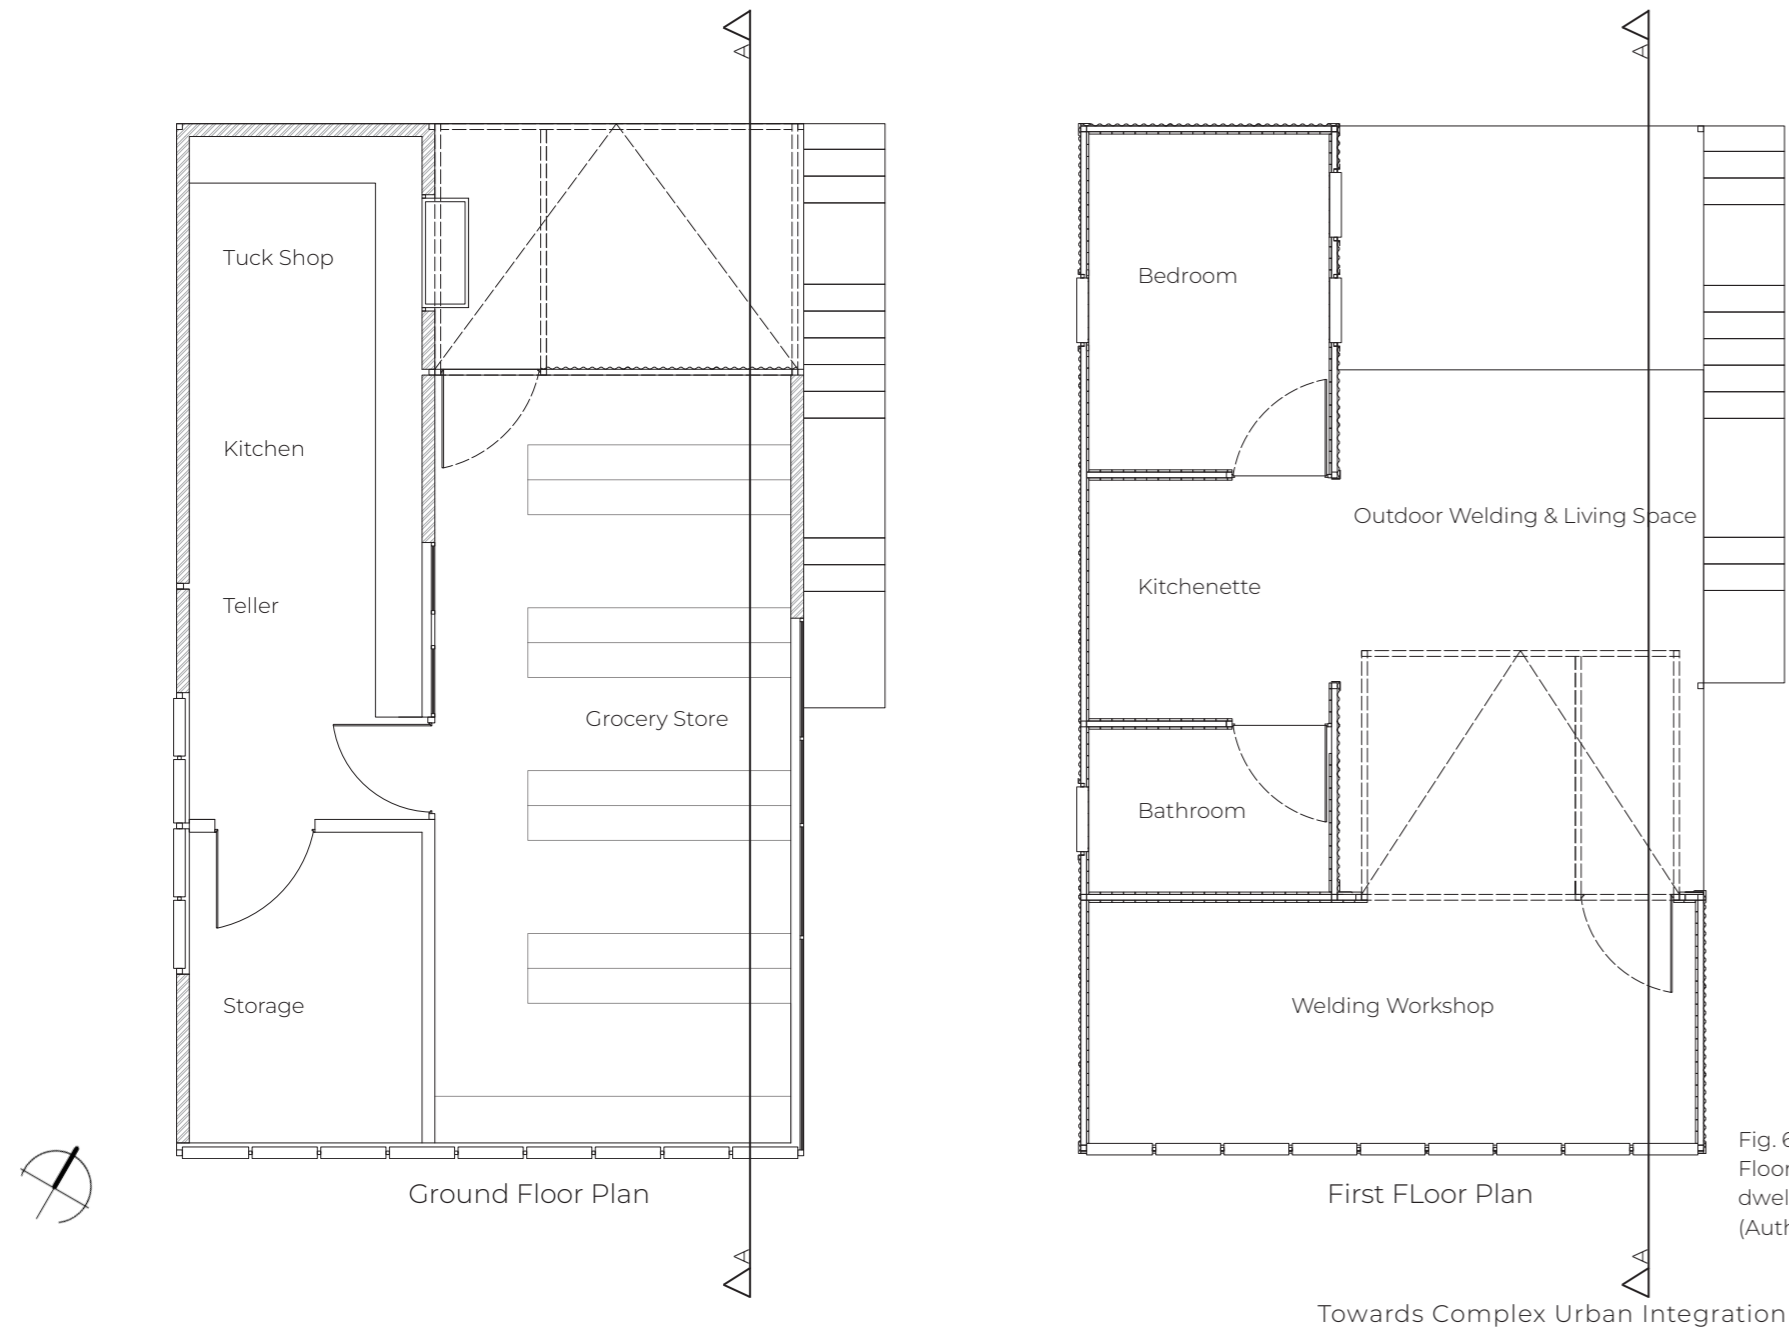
Iteration 1 - Floor Plans of Alex's dwelling (Author 2022)
